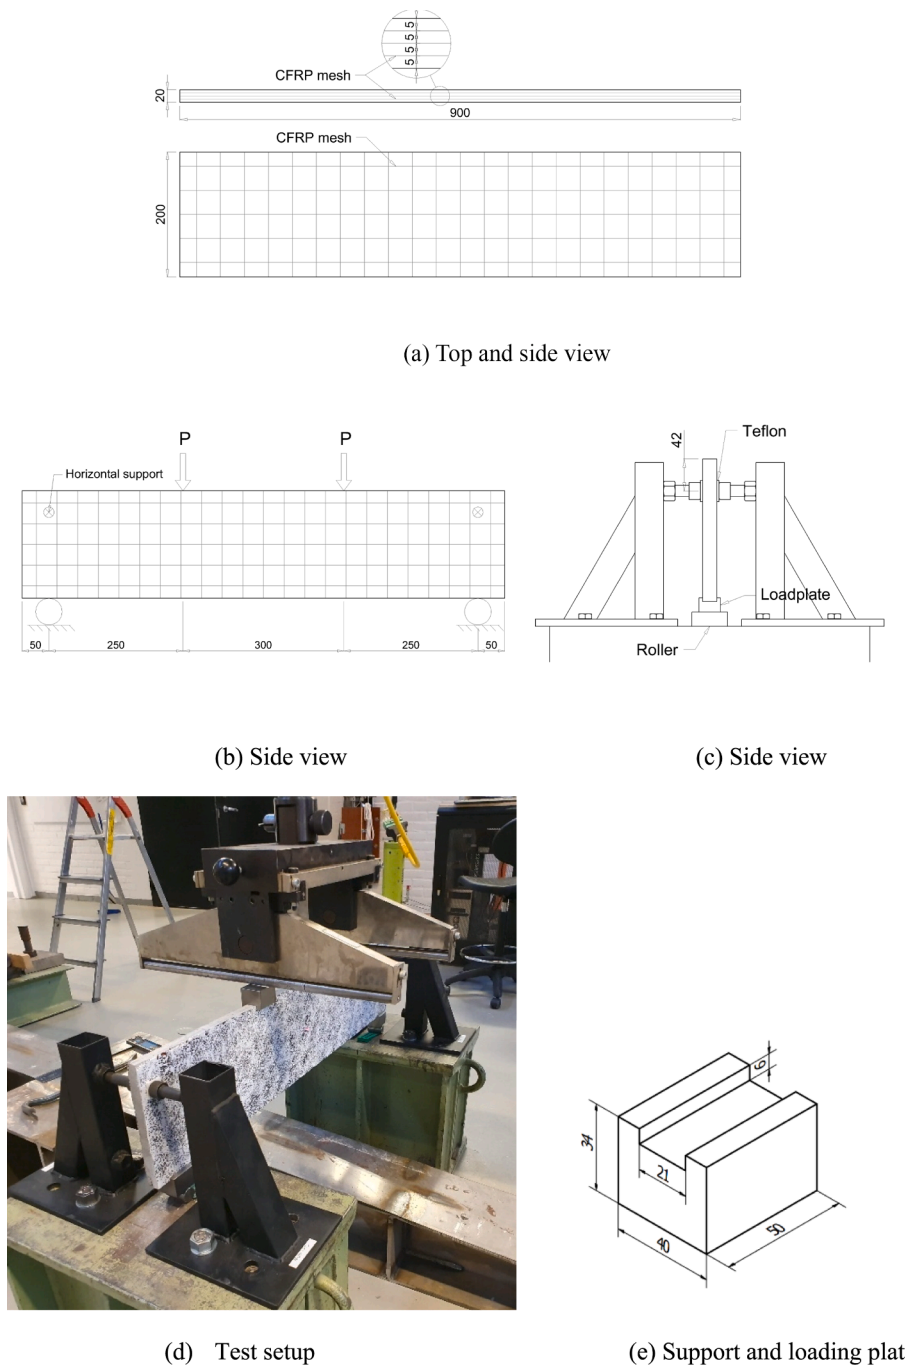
Tests of deep beams. (a) Drawing of specimens; measurements in mm; (b) Test set-up; (c) Drawing of test setup from the side, showing the arrangement of the vertical and horizontal supports; (d) Photo of the test setup (d) Drawing of vertical support and loading plates.
